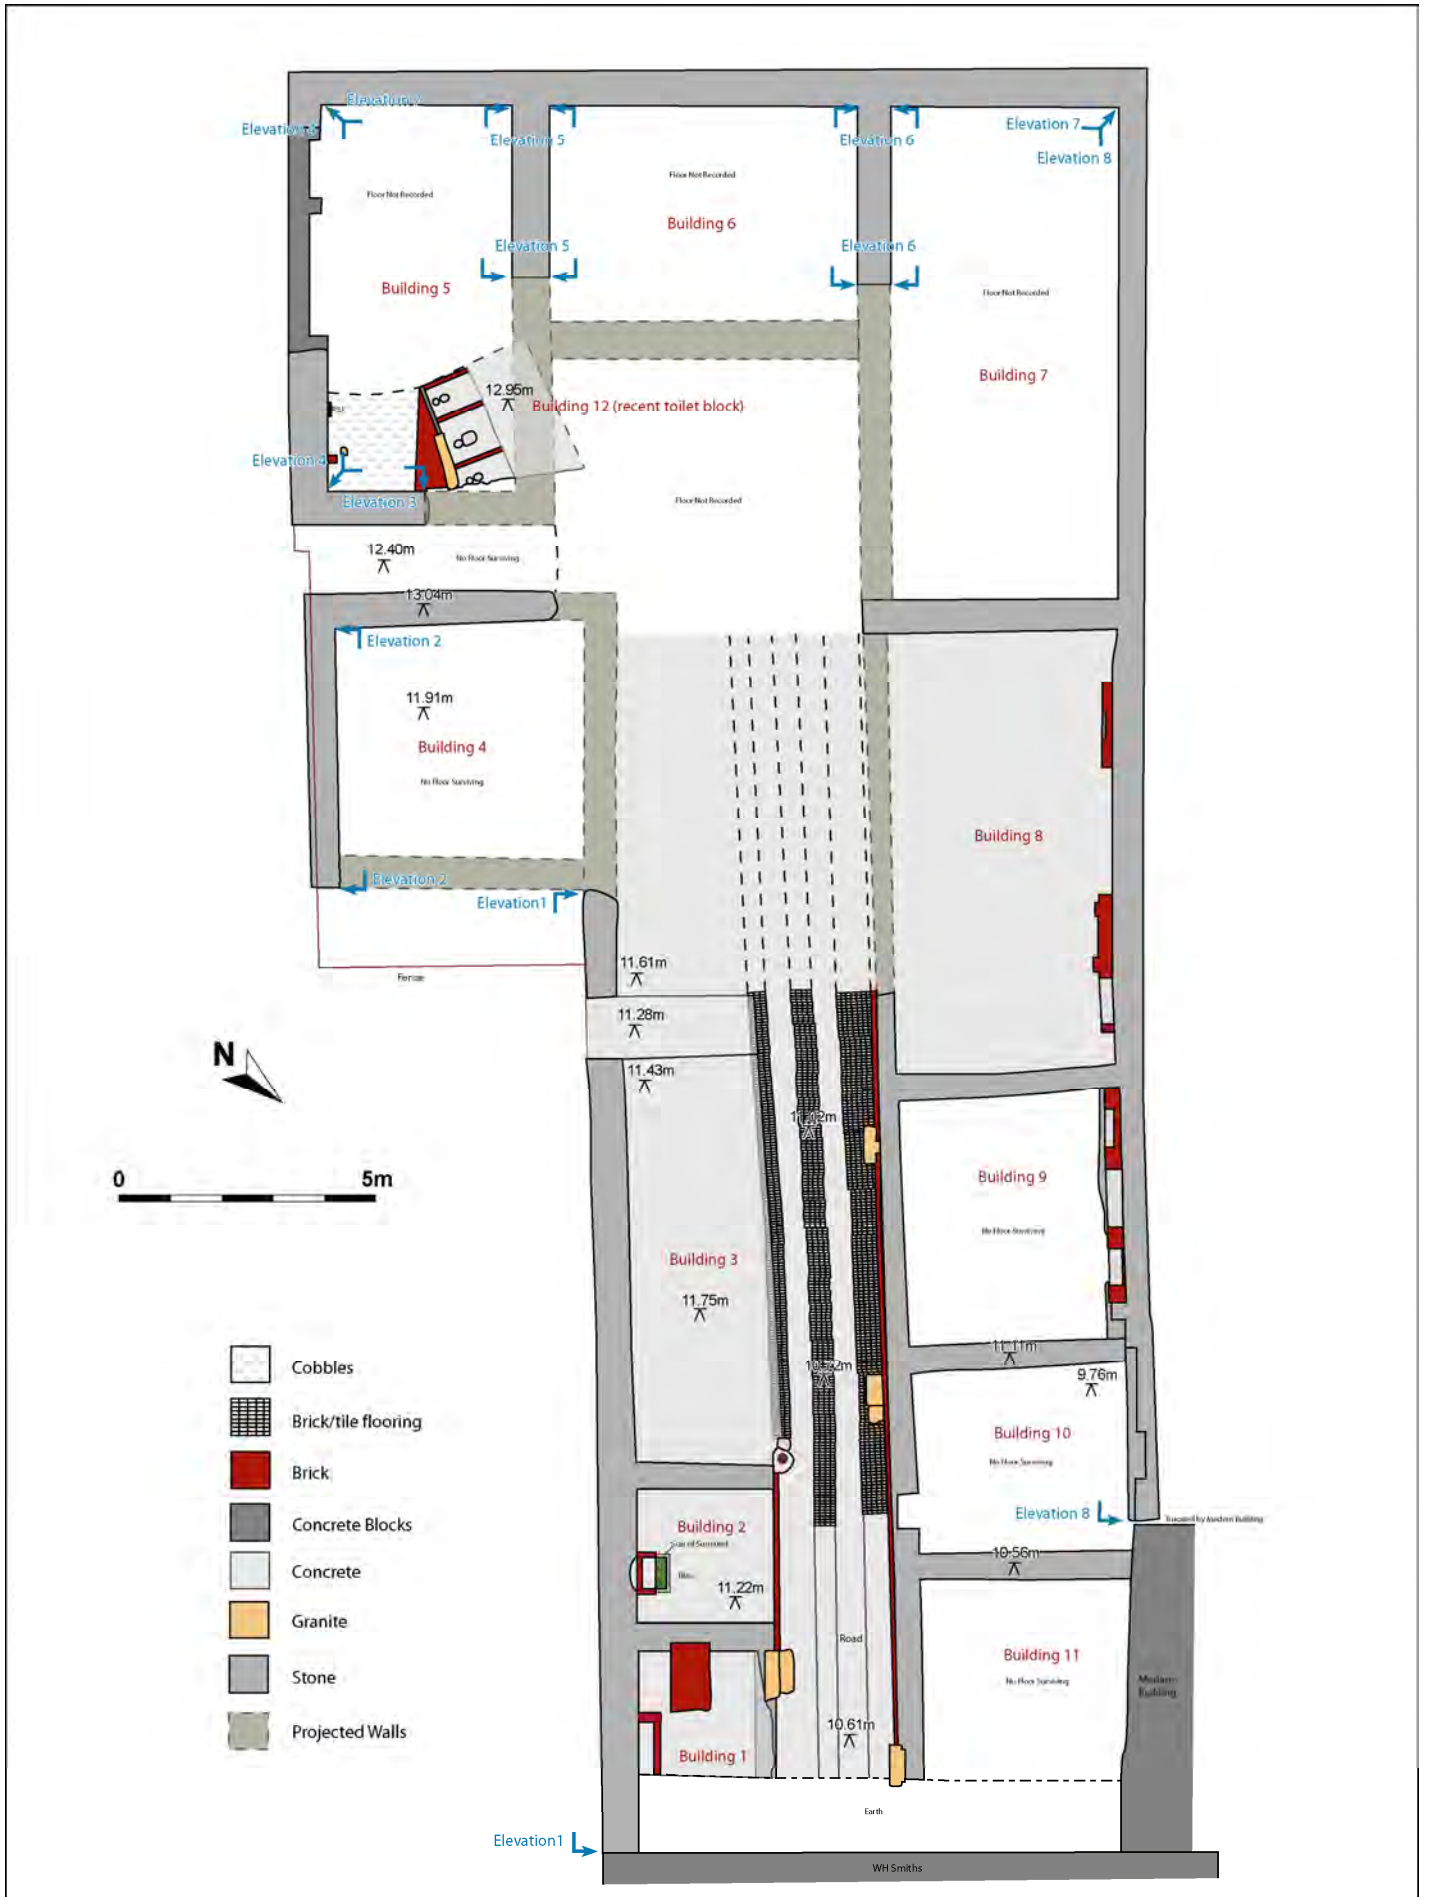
Plan of the surviving structures and locations of the elevation drawings.
